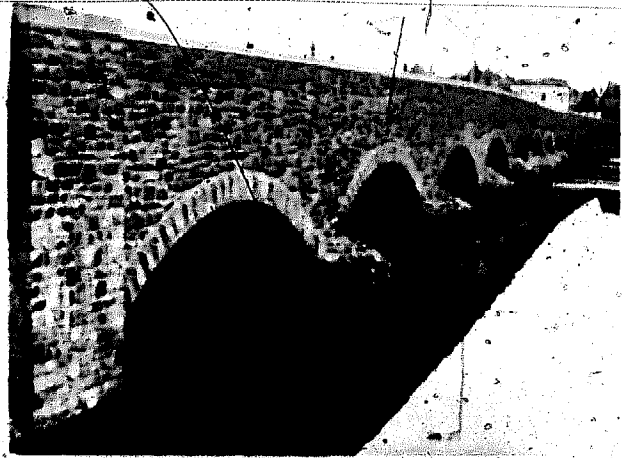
Multi-arch bridge Barnstaple Bridge, eighteenth century
